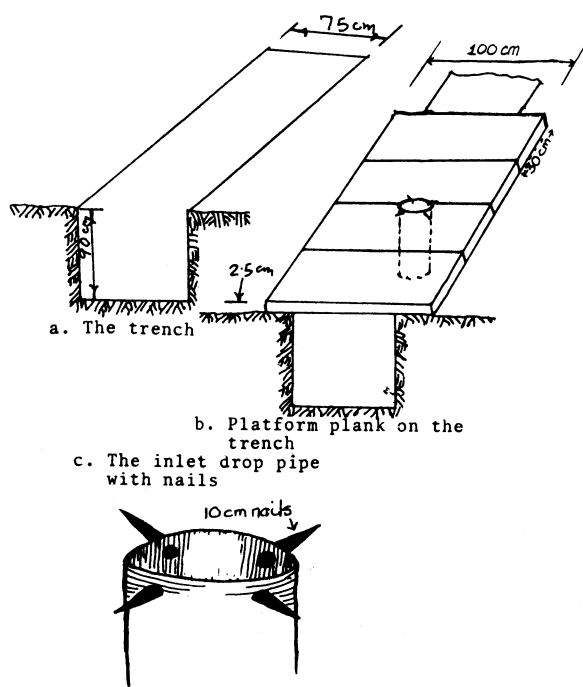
Fig. II. Sketches showing trench method of aqua privy floor slab construction.
